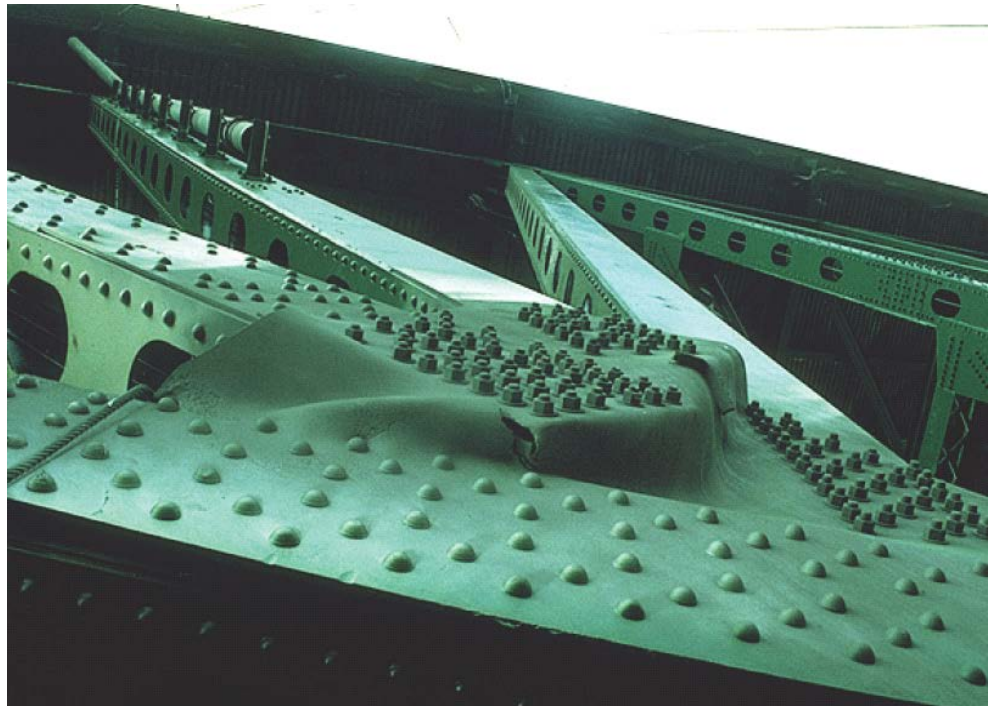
Gusset Plate Buckling (Compression) Failure due to Major Gusset Plate Section Loss
